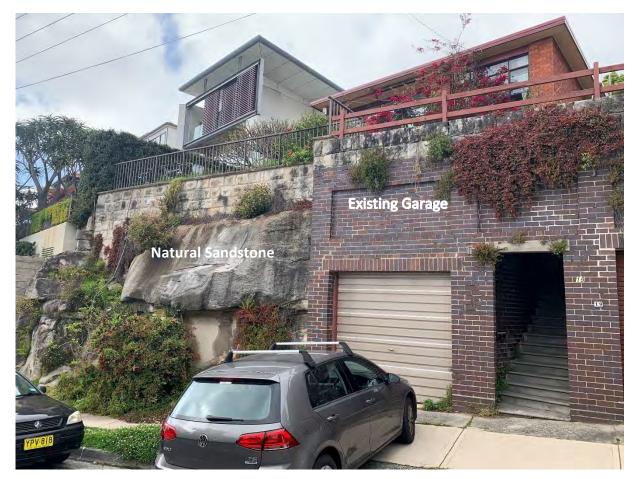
Naturally occurring sandstone to front of the subject site which is recommended to be protected.
